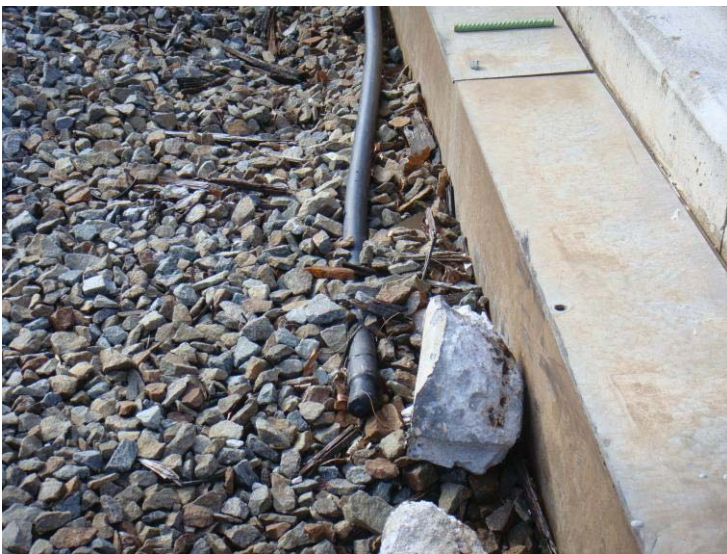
K2 CM568+00 - X-over return lead lying against retaining wall
